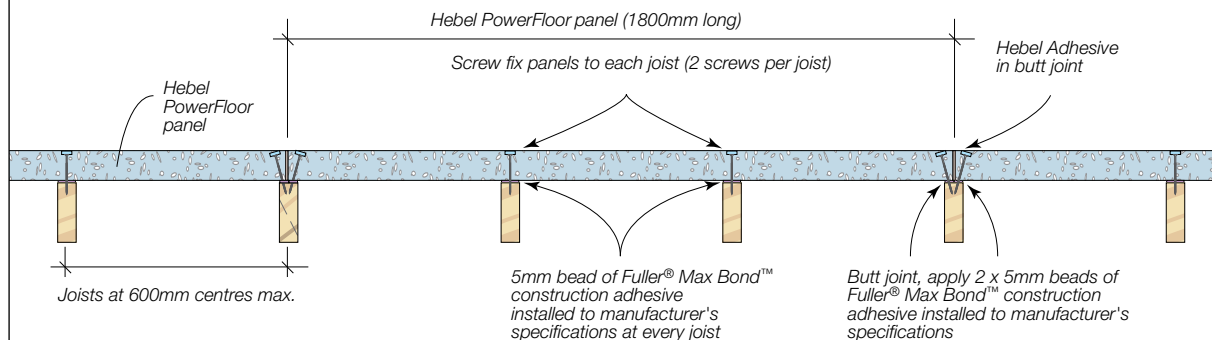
Fixing of Hebel PowerFloor Panel to Timber Joists
